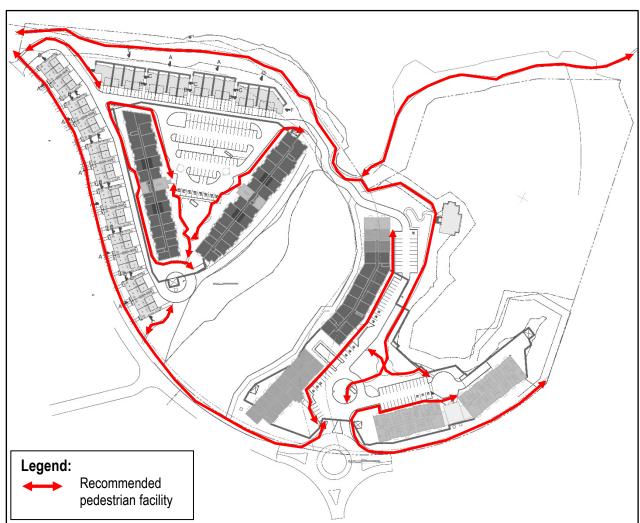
Recommended Internal Site Pedestrian Mobility Plan
